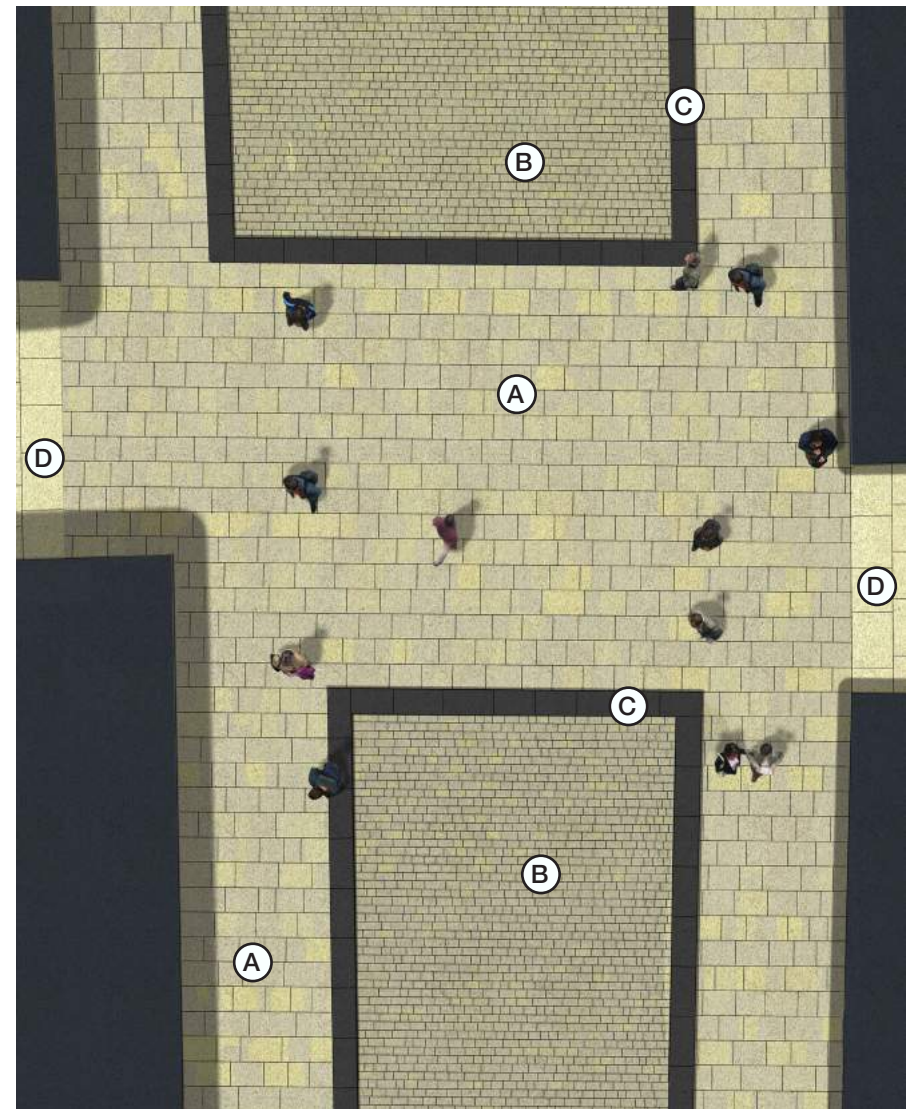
Concept sketch plan illustrating typical layout and materials of the street (Example Maidenhead Street)
